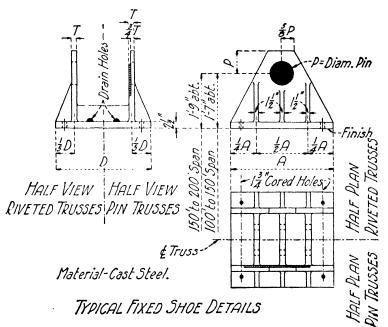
SHOE DETAILS. CHICAGO, MILWAUKEE & ST. PAUL RY.
